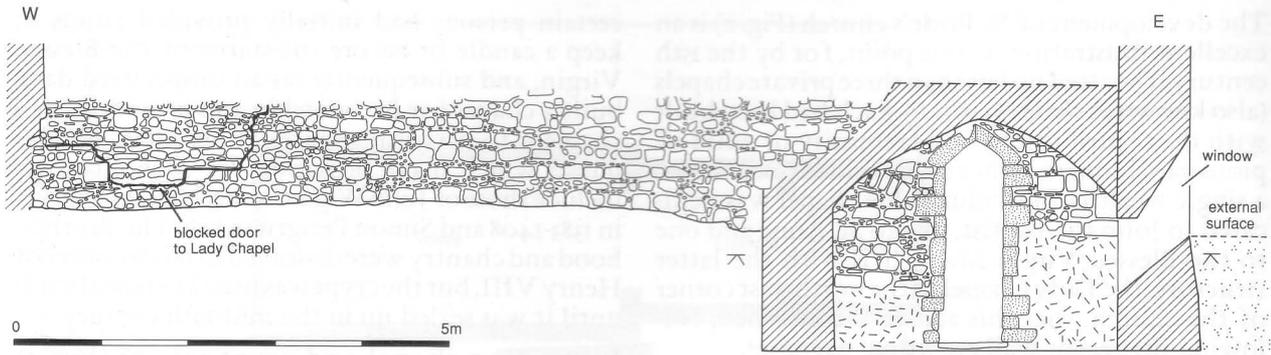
semi-reconstructed elevation of surviving remains of Lady Chapel, with foundations omitted. It shows internal face of the north wall, with crypt below altar.
